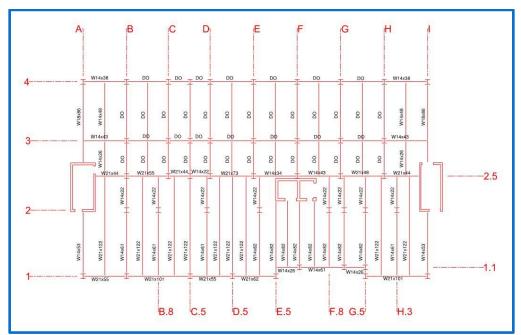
2<sup>nd</sup> Floor Framing Plan
